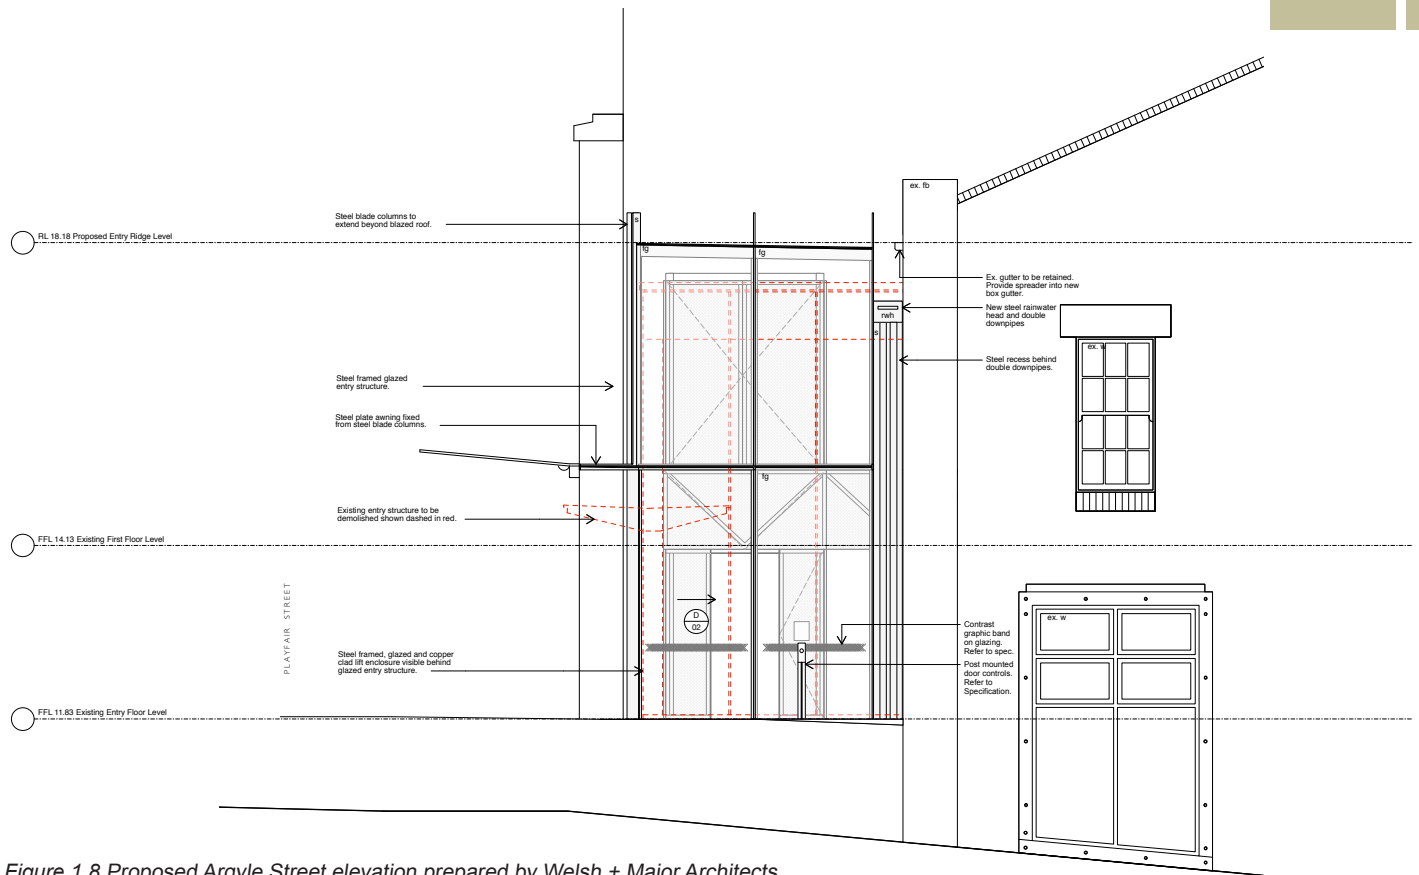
Proposed Argyle Street elevation prepared by Welsh + Major Architects.
